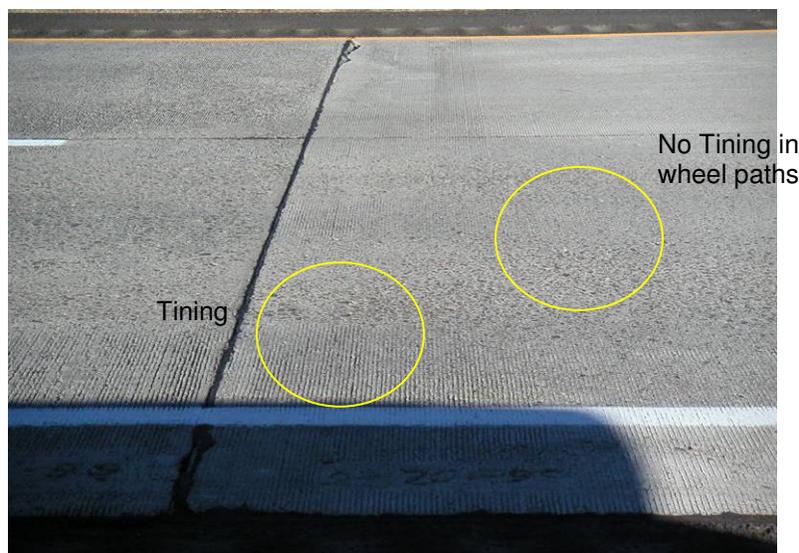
Concrete pavement on SR-395 south of Interstate 90 interchange.
